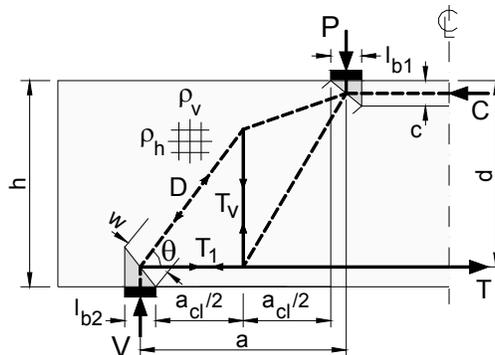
Refined strut-and-tie model takes account of crack control reinforcement and curving compressive stresses in deep beam (Mihaylov, Bentz and Collins 2011).
